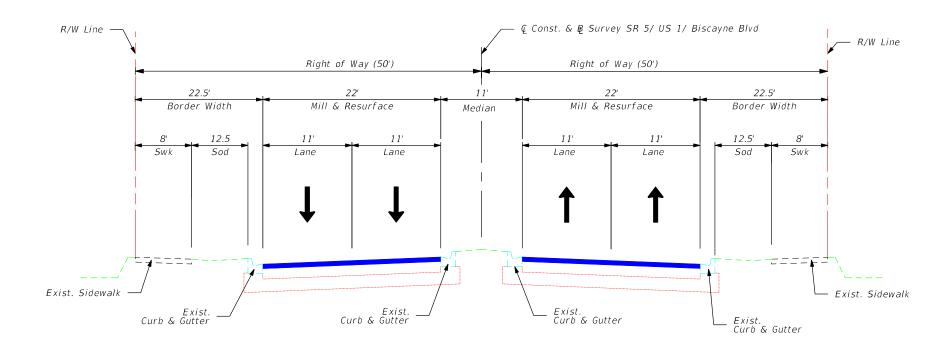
Recommended Typical Section from NE 90th Street to NE 93rd Street
